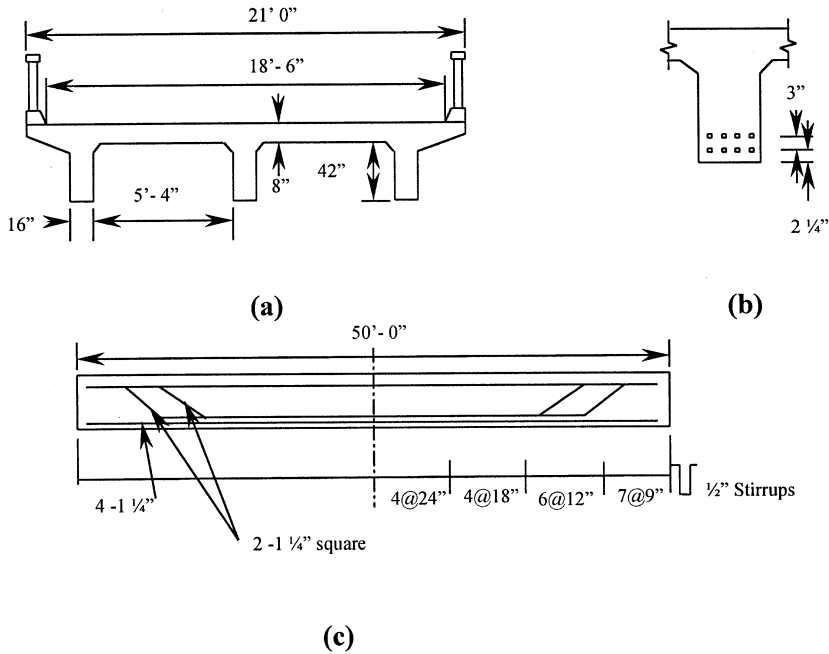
Details of simply supported T-beam concrete bridge example. (a) Typical cross section; (b) reinforcement locations; (c) T-beam girder details.
